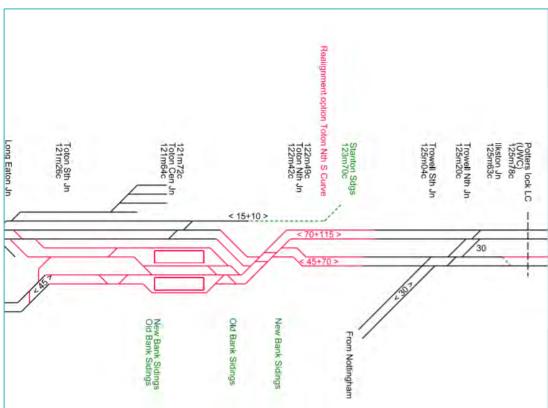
Toton Variant 2. Simplified Schematic (revised Trent Junctions area layout not shown)
